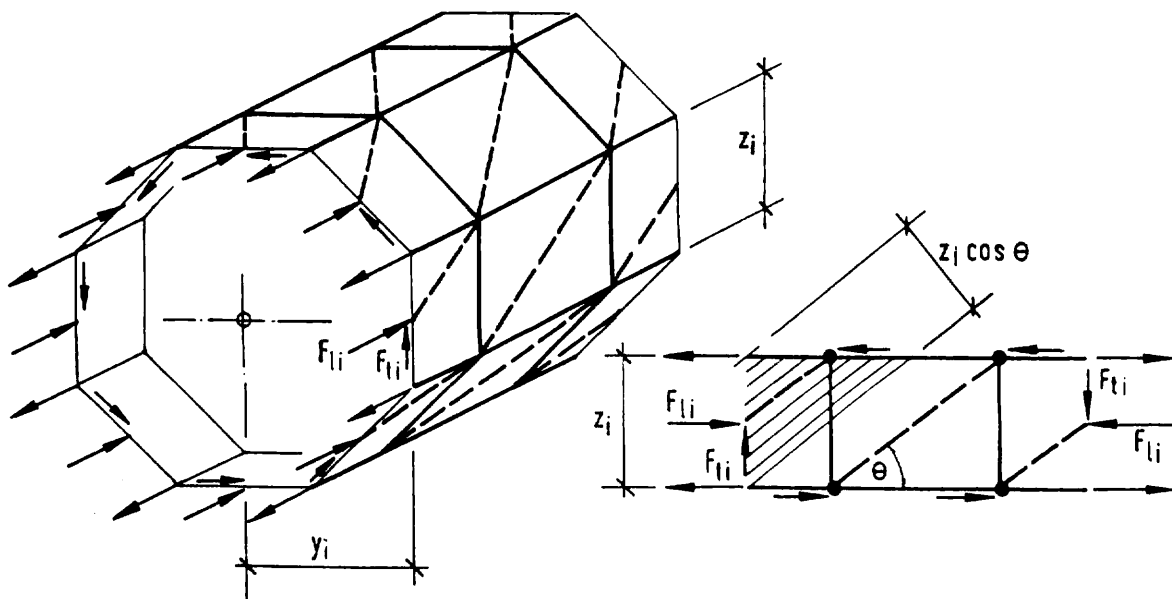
Truss modelling of a polygonal section resisting torsion
